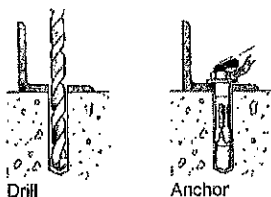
Illustration of drilling process to drill hole in concrete and anchor bolt to secure yoke.
